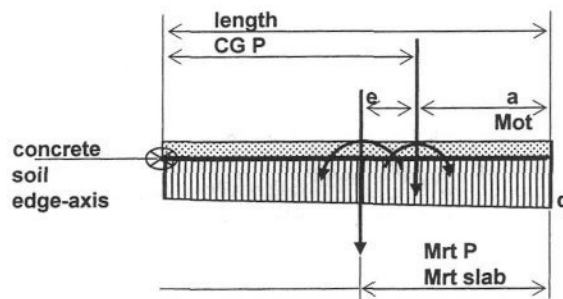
TRAPAZOIDAL FOOTING PROFILE
